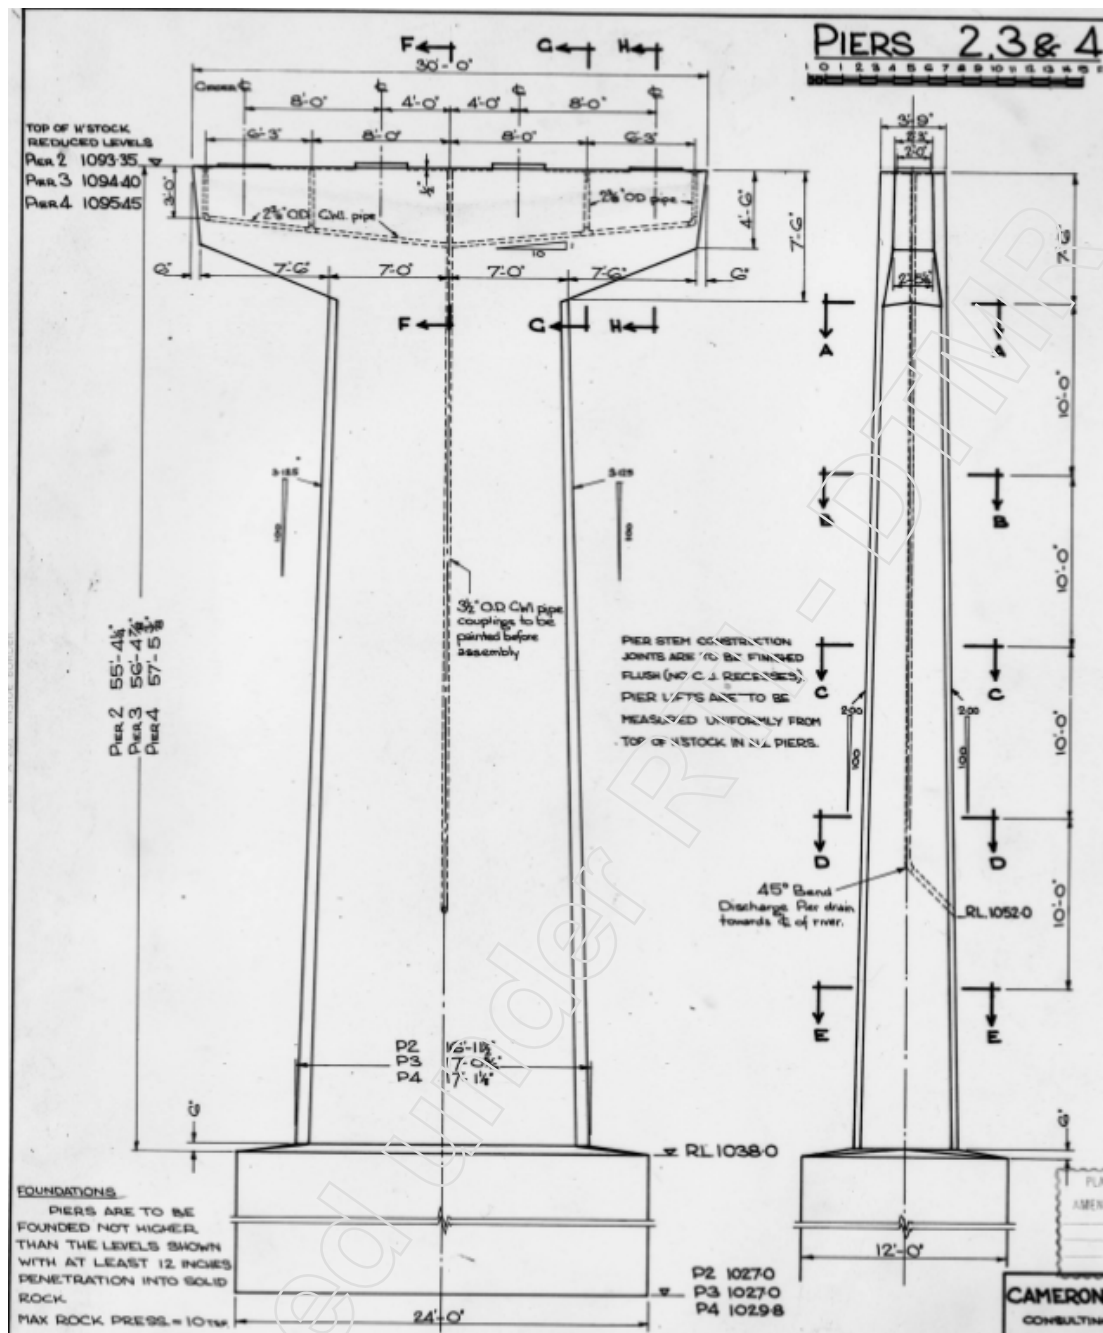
Piers 2, 3 & 4 (Piers 1 & 5 similar)
